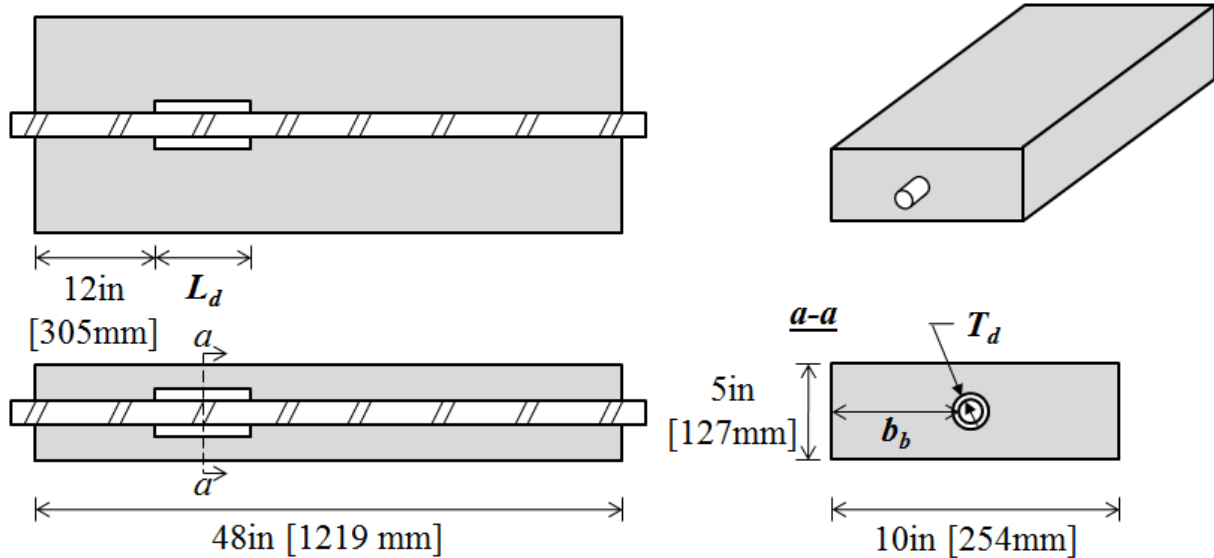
Geometry of Samples Containing One Reinforcing Bar.
